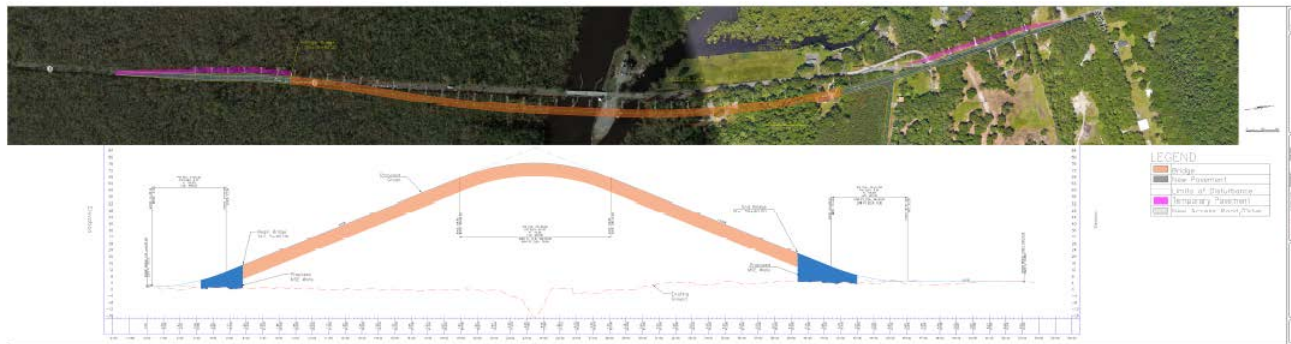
Conceptual Plan for the East Alignment Fixed Bridge.
